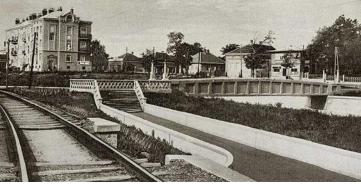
Concrete pedestrian bridge; Figure 93. Concrete pedestrian bridge from postcard from 1930's<sup>14</sup>
